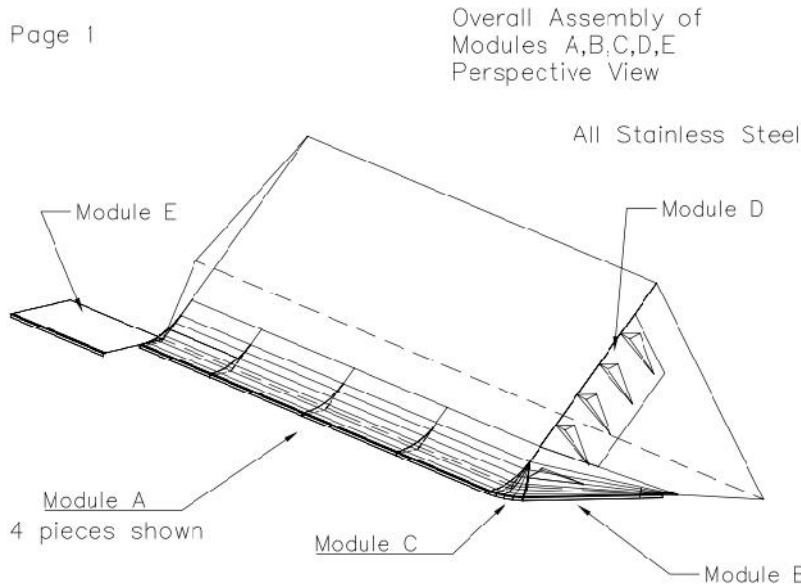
Example stainless steel scAUR™ retrofit for a spill-through abutment.
